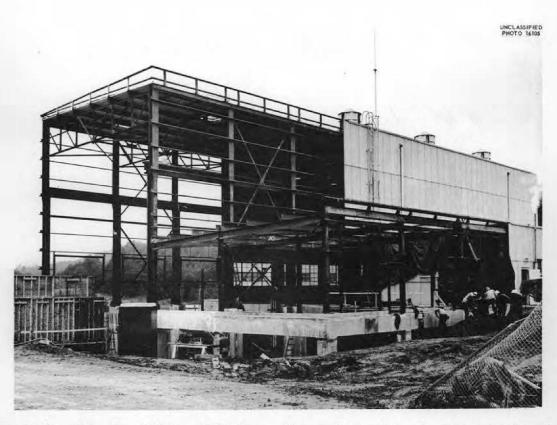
View of Building 7503 from the Southeast. Photograph taken during the early stages of construction, showing the major portion of the structural steel required for the extension to the existing building.
